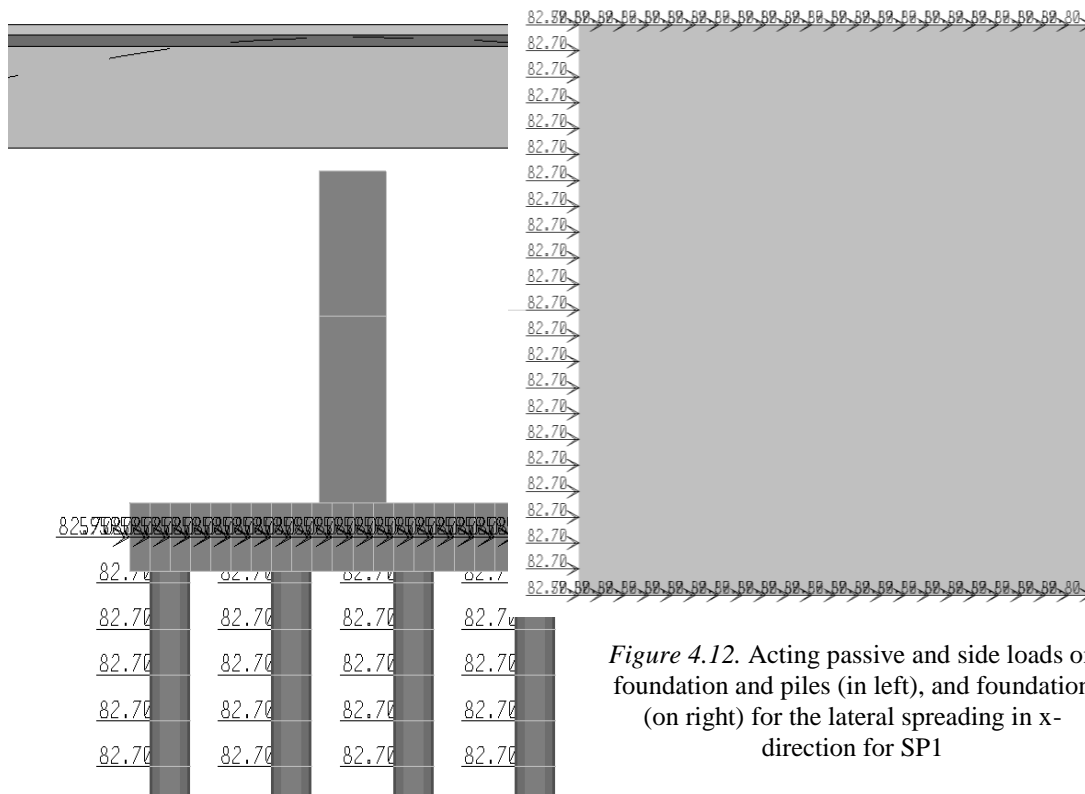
Acting passive and side loads on foundation and piles (in left), and foundation (on right) for the lateral spreading in x-direction for SP1
